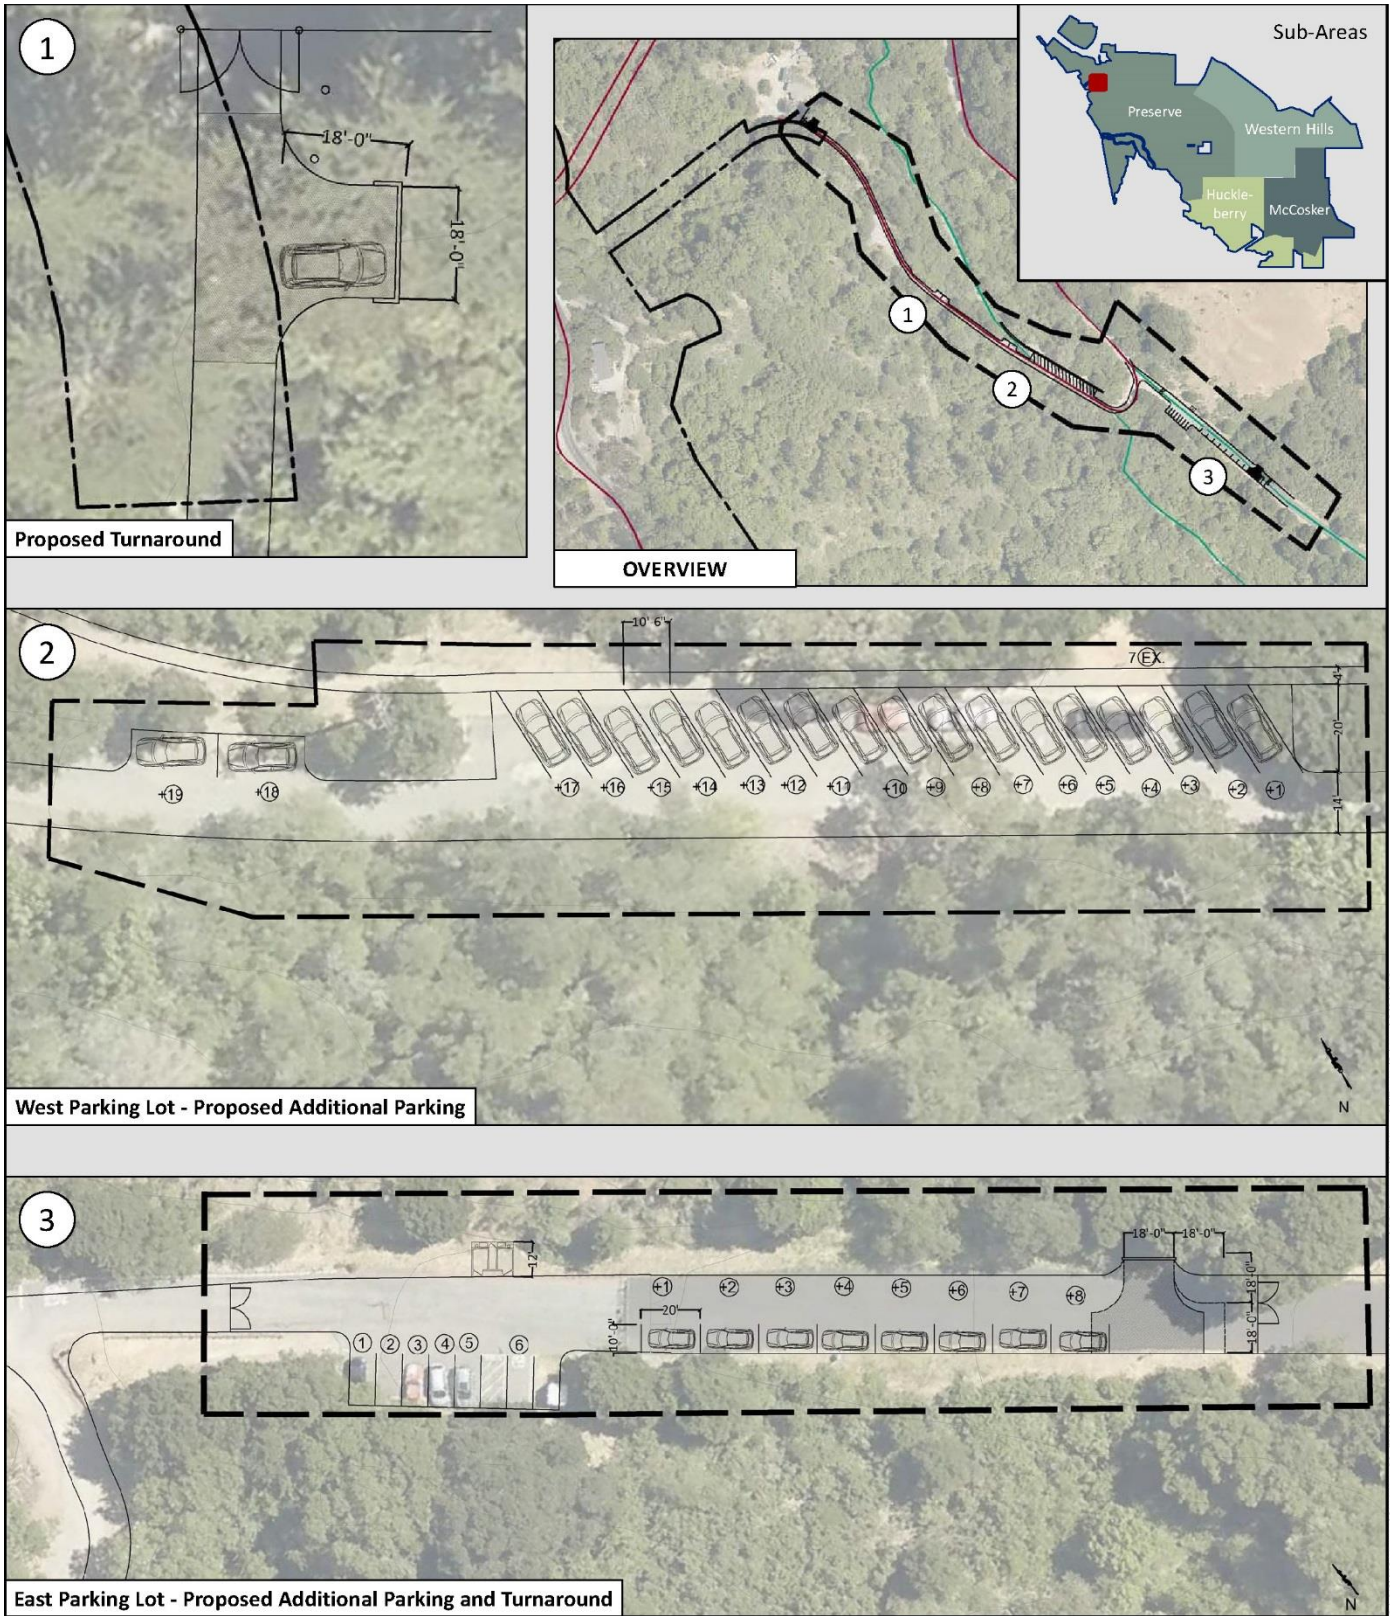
PROPOSED PARKING LAYOUT, OLD TUNNEL ROAD. PRESERVE SUB-AREA
